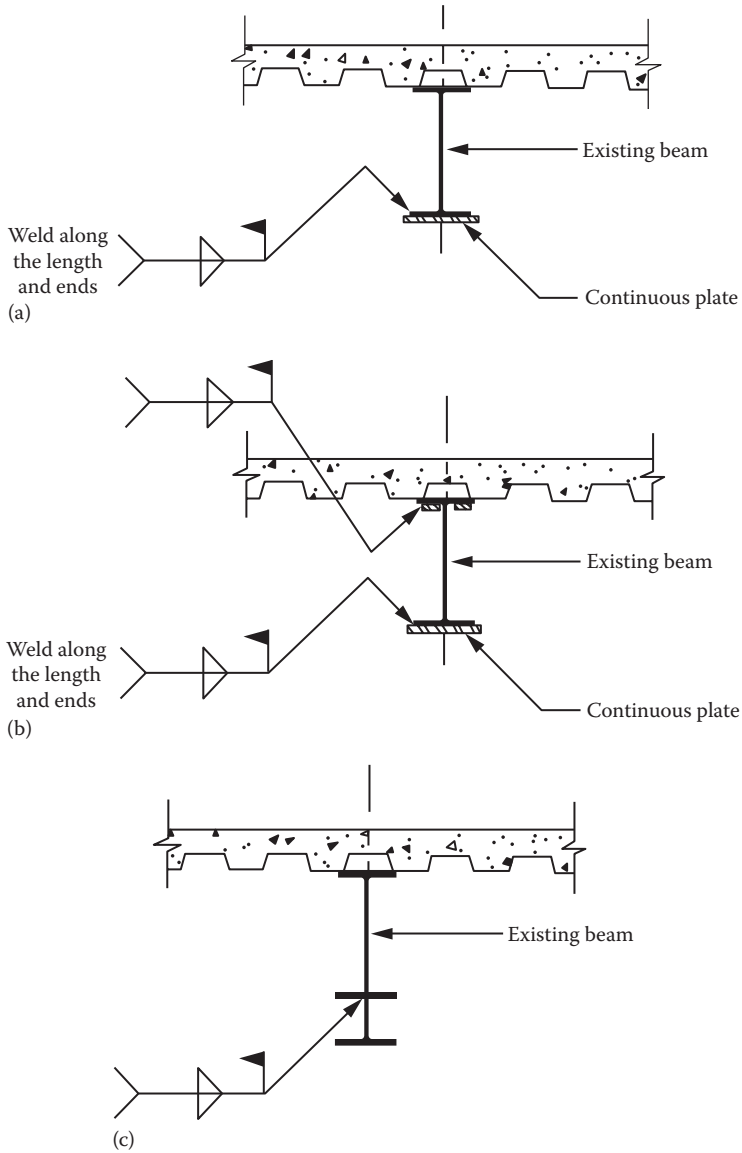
Reinforcing existing beams by welding: (a) cover plate welded to the bottom flange, (b) cover plates welded to both flanges, and (c) WT section welded to the bottom flange.
